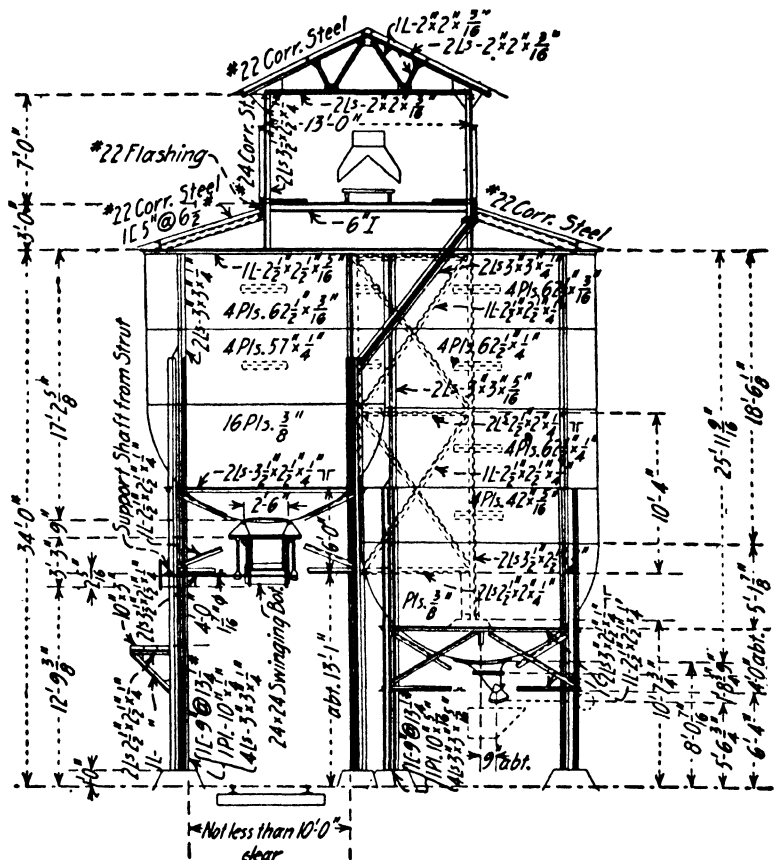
ELEVATION CIRCULAR STEEL ORE BIN FOR OLD DOMINION COPPER MINING CO.
